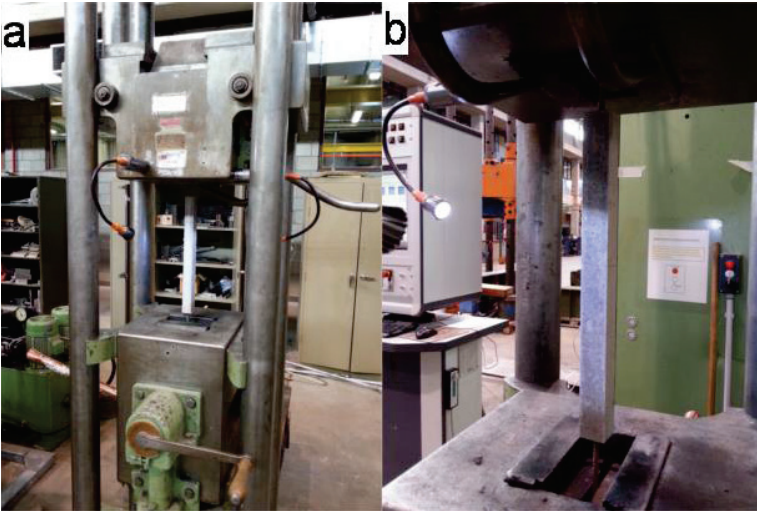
Test setup for cracking of the reinforced mortar specimens (a) instrument used for tensile loading; (b) a closer view of the specimen and formation of cracks
